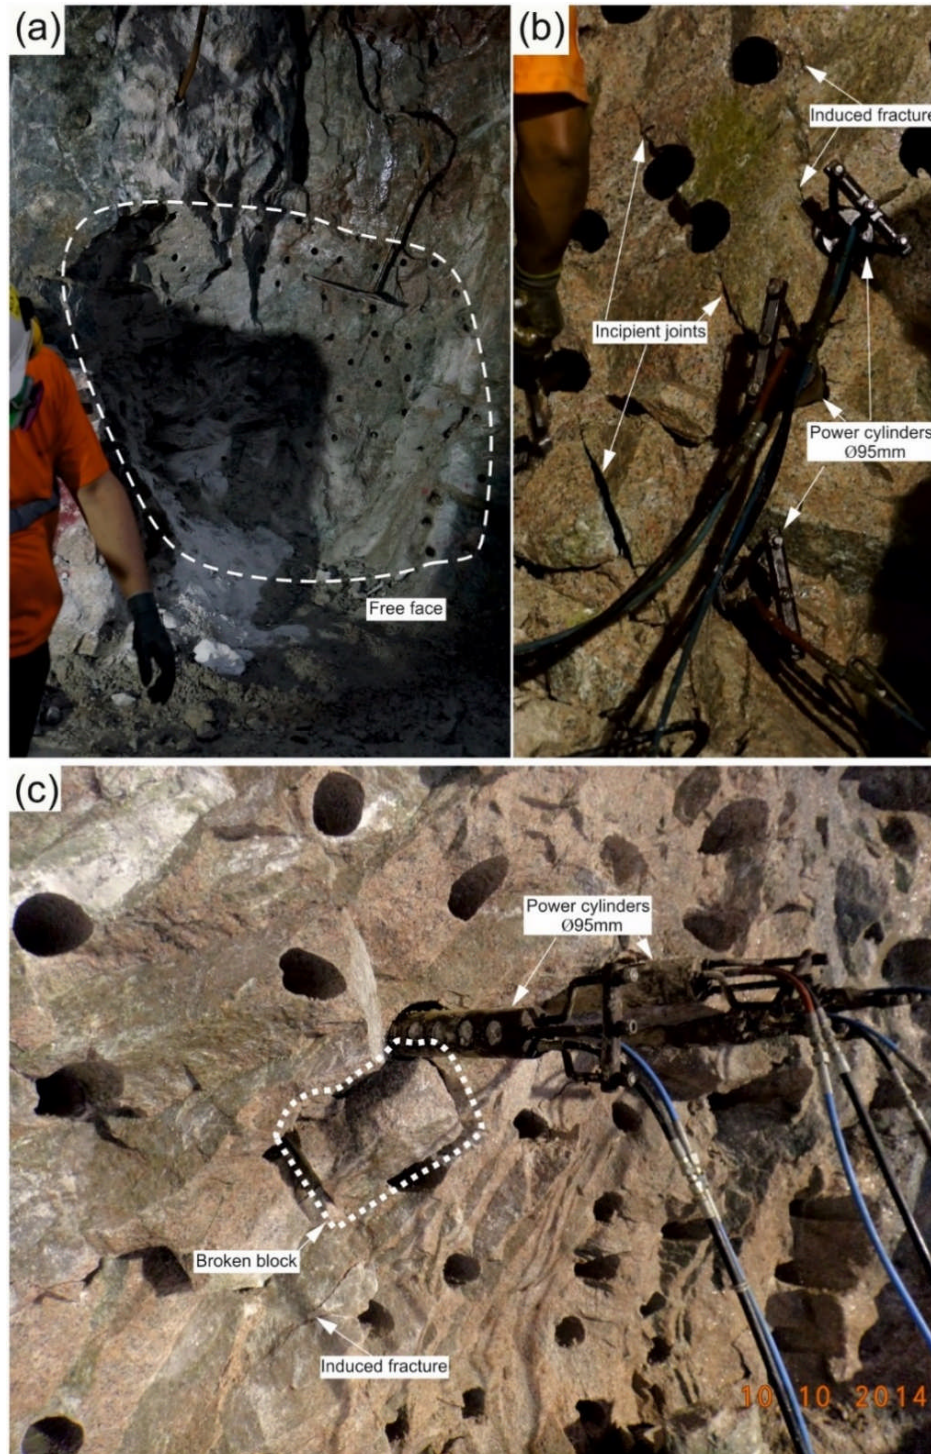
Construction of Mass Transit Railway (MTR) - Admiralty section in Hong Kong. A hydraulic rock splitter (model PRS-95) was employed in the excavation of an underground tunnel where blasting was not allowed because of adjacent engineering works. a Predrilled holes with diameter of 100 mm on the free face; b Holes were drilled along several parallel incipient joints, note that irregular fractures were induced by the upper power cylinder; c A small rock block was broken from the free face and an induced fracture can be seen. It took around 2-4 mins for this PRS-95 rock splitter to break rock for each run.
